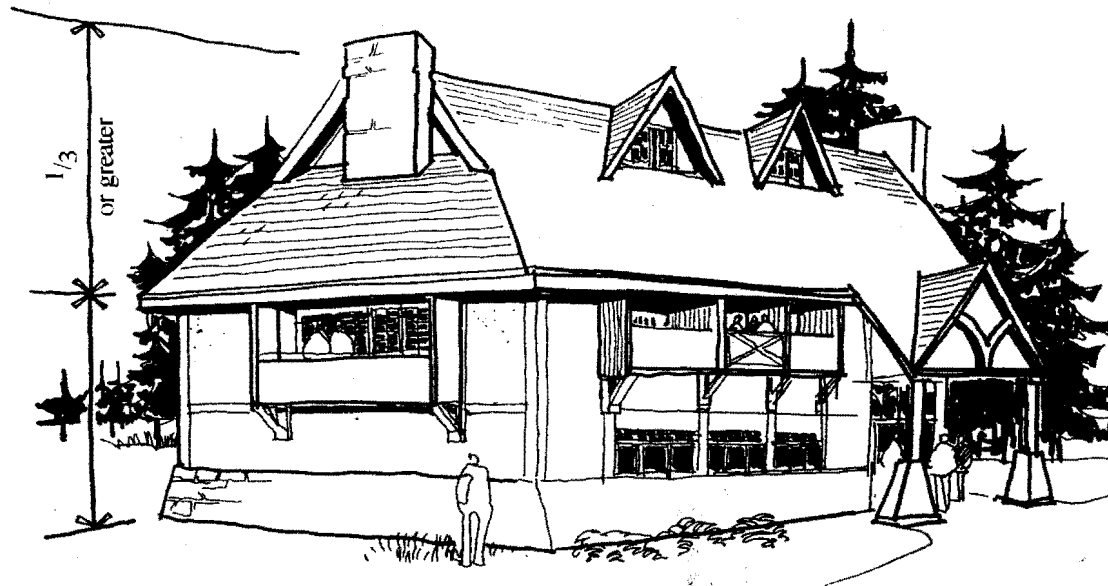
As a general rule, the roof should constitute at least one-third of the overall building height.
